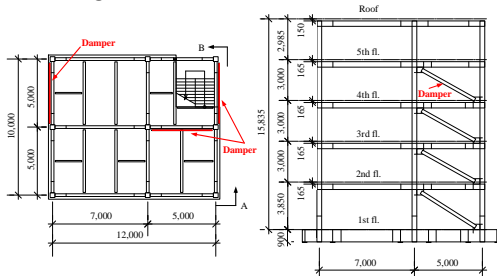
Full-Scale 5-story Building with Dampers (E-Defense Tests)
